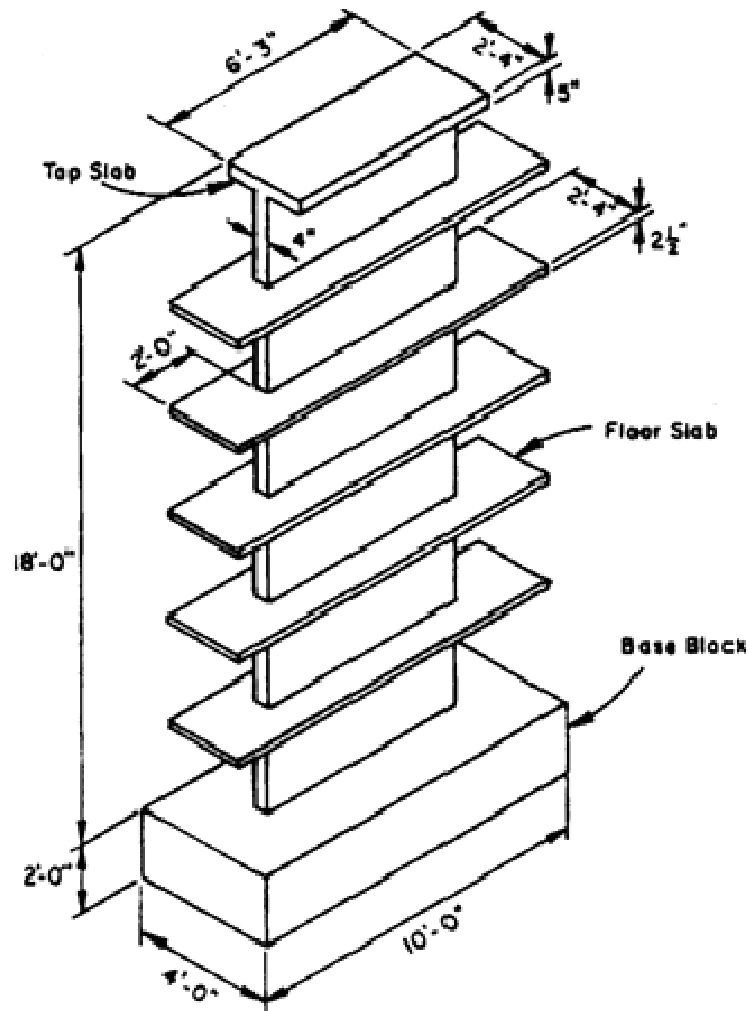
Wall specimen without openings tested by Shin et al. (1981).
